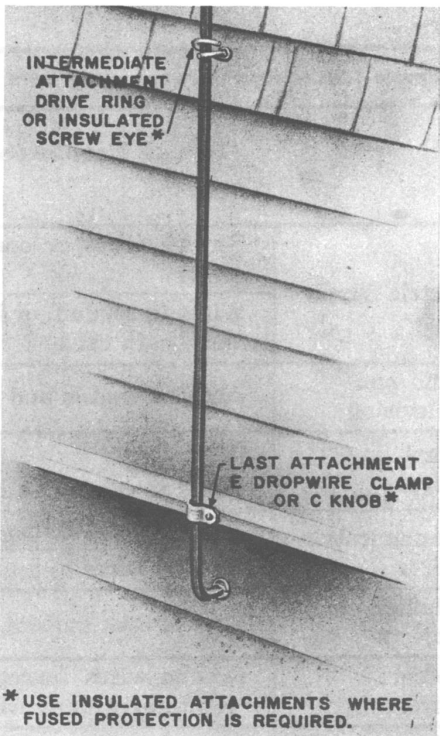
Crossing Wood or Stucco on Wood Building Projection
